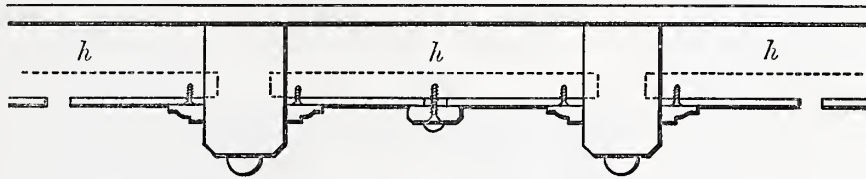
Wood Ceiling. Section, showing Space contrived under Floor for Packing.
